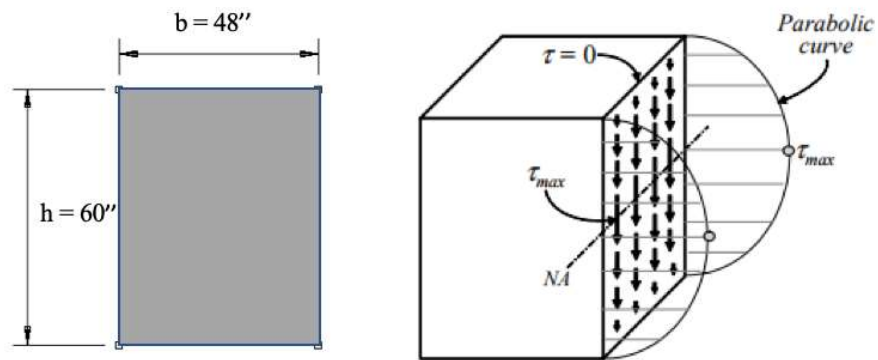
Cross Section (left) of Cracked Pier-cap and Shear Stress Distribution (right)
